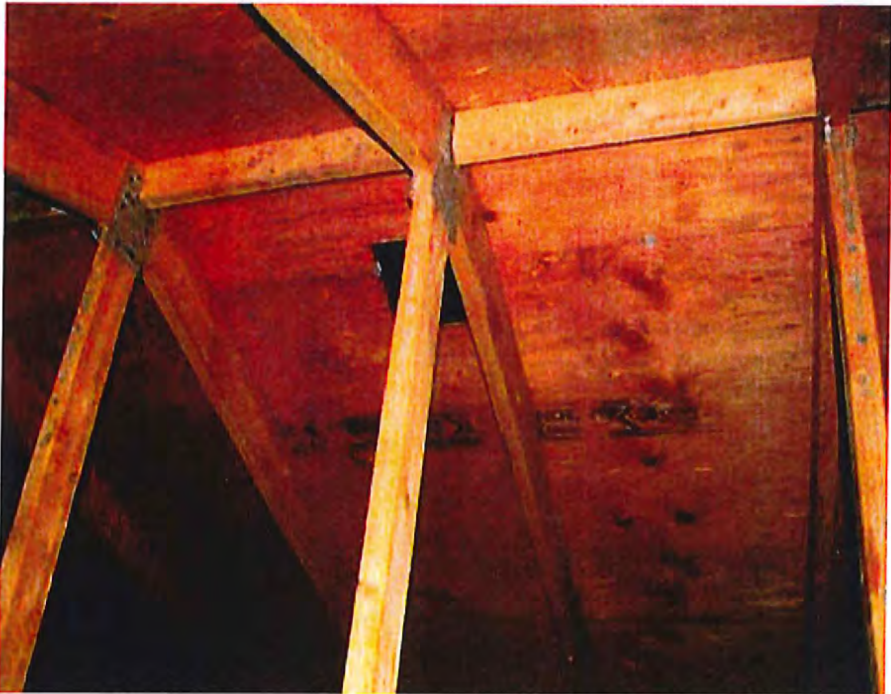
Roof trusses configuration showing existing plywood sheathing
